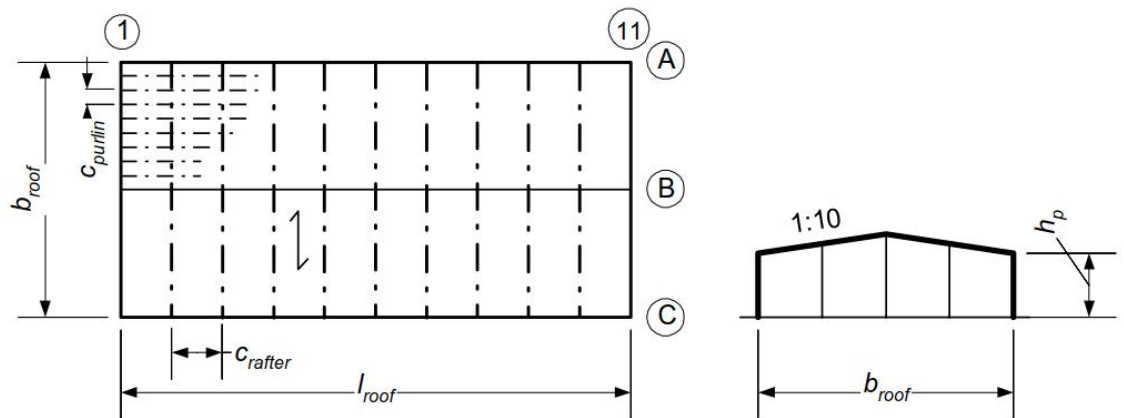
Building with roof sheets on purlins (Höglund, 2002)
